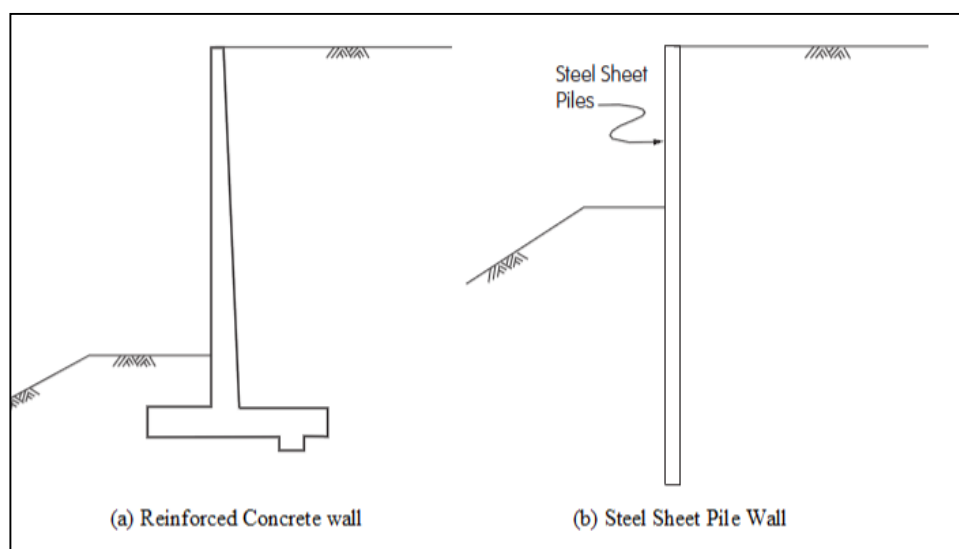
Retaining walls: (a) rigid wall, (b) flexible wall (Ramadan 2013)
